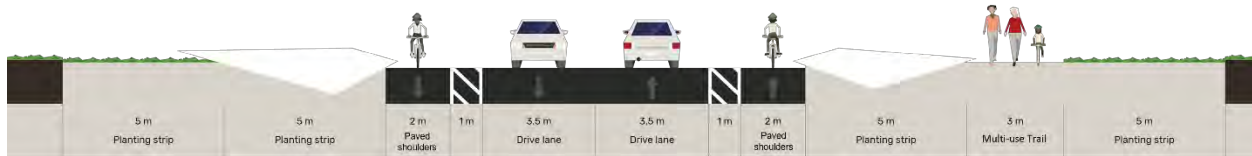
Typical Midblock Cross Section, 36m Type B Arterial, Two-Lane Rural with Class I Trail (In-Boulevard Multi-use Trail) and On-road Cycling Lanes (Paved Shoulders)
